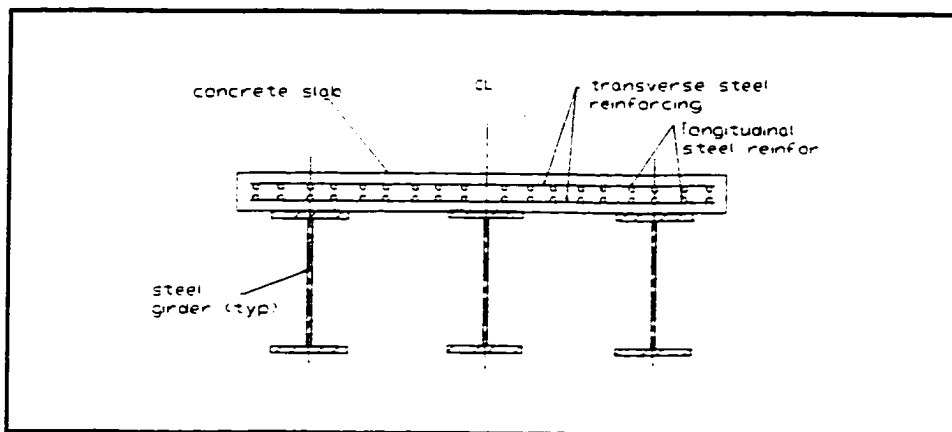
Section through a conventionally reinforced slab-on-girder bridge
